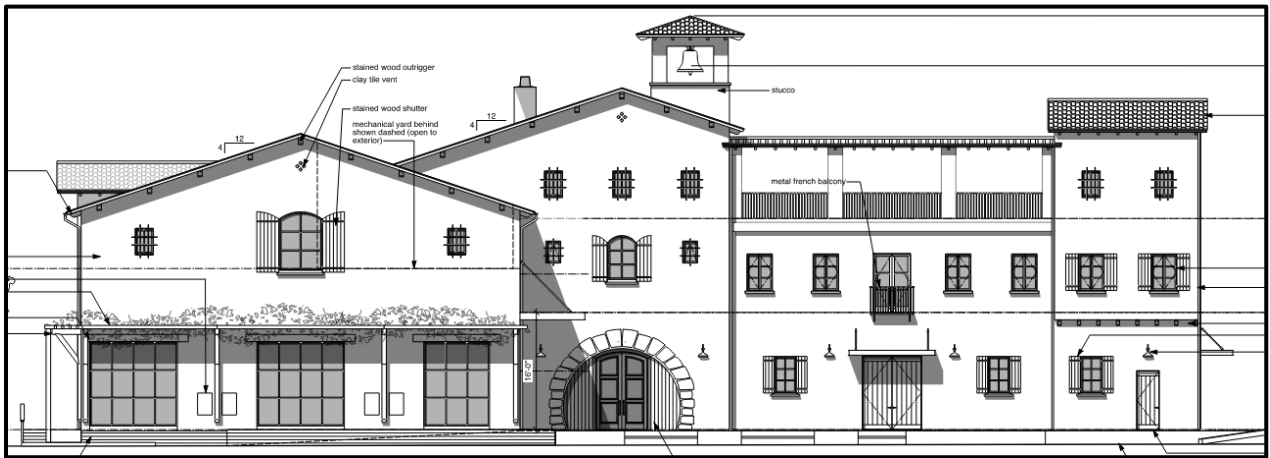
First Street Elevation – Modified (Attachment E, Sheet A3.01)
